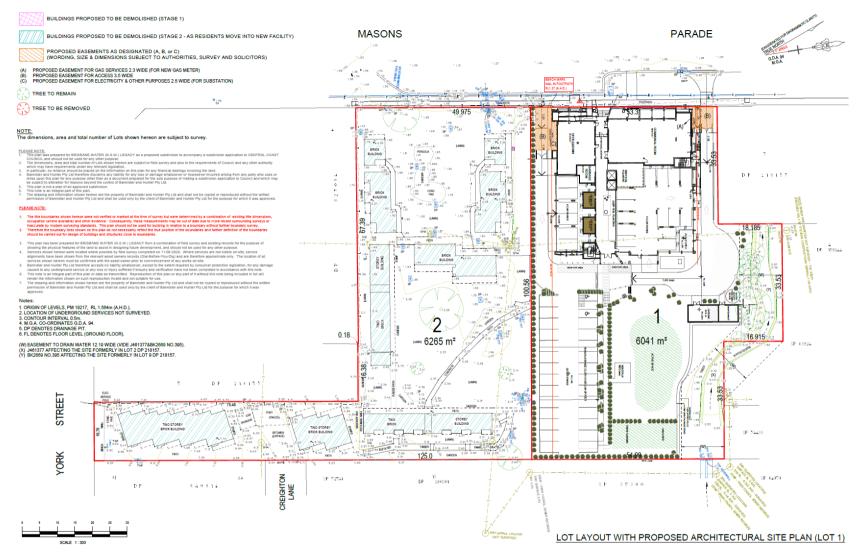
| Proposed Subdivision Plan (Source: Applicant's documentation)
